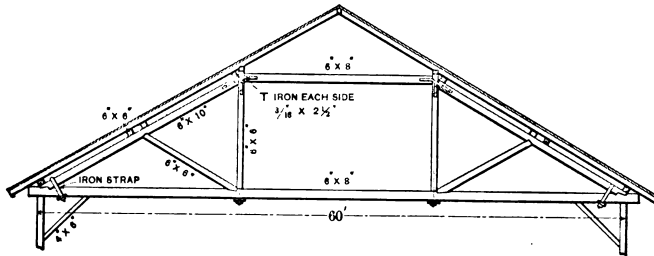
Elevation of Roof Truss, Submitted by "F. D. R." as an Improvement Upon that of "A. B. C."—Scale, 1-16 Inch to the Foot.
